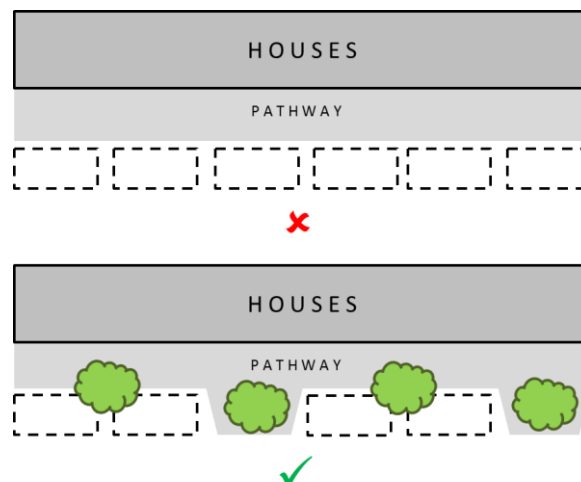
above: *On street parking punctuated with street trees and wider pathways, subduing the impact of vehicles parked in front of dwellings.
